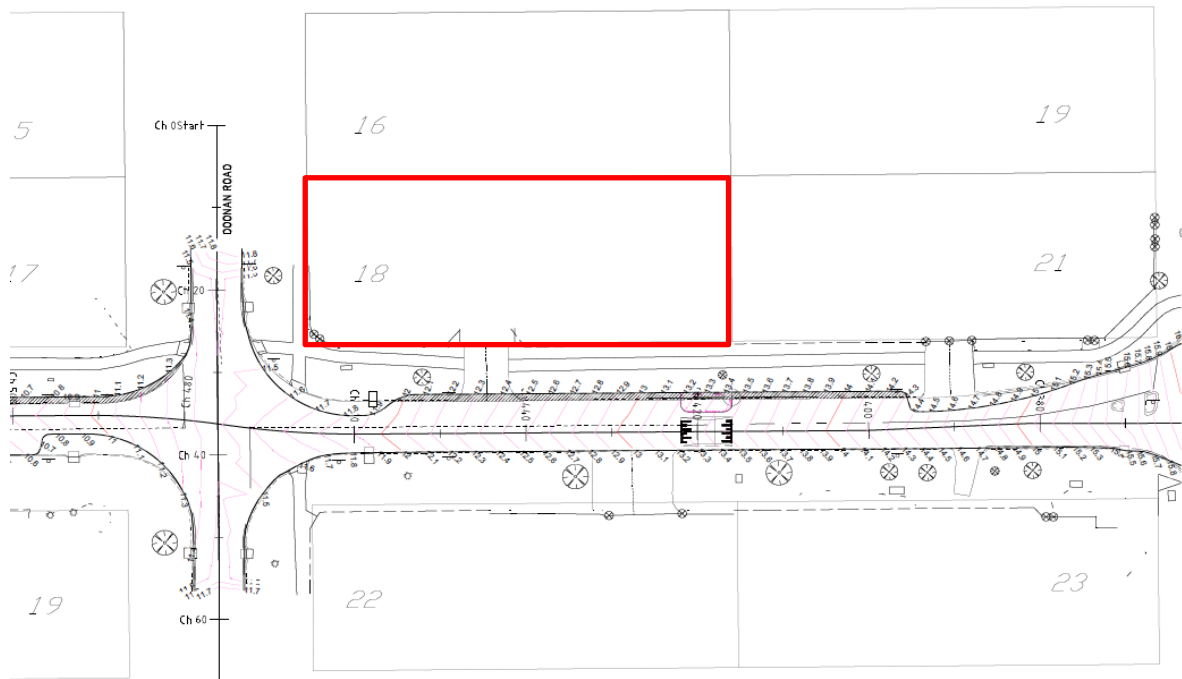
Safe Active Streets current design for No. 18 Doonan Road
